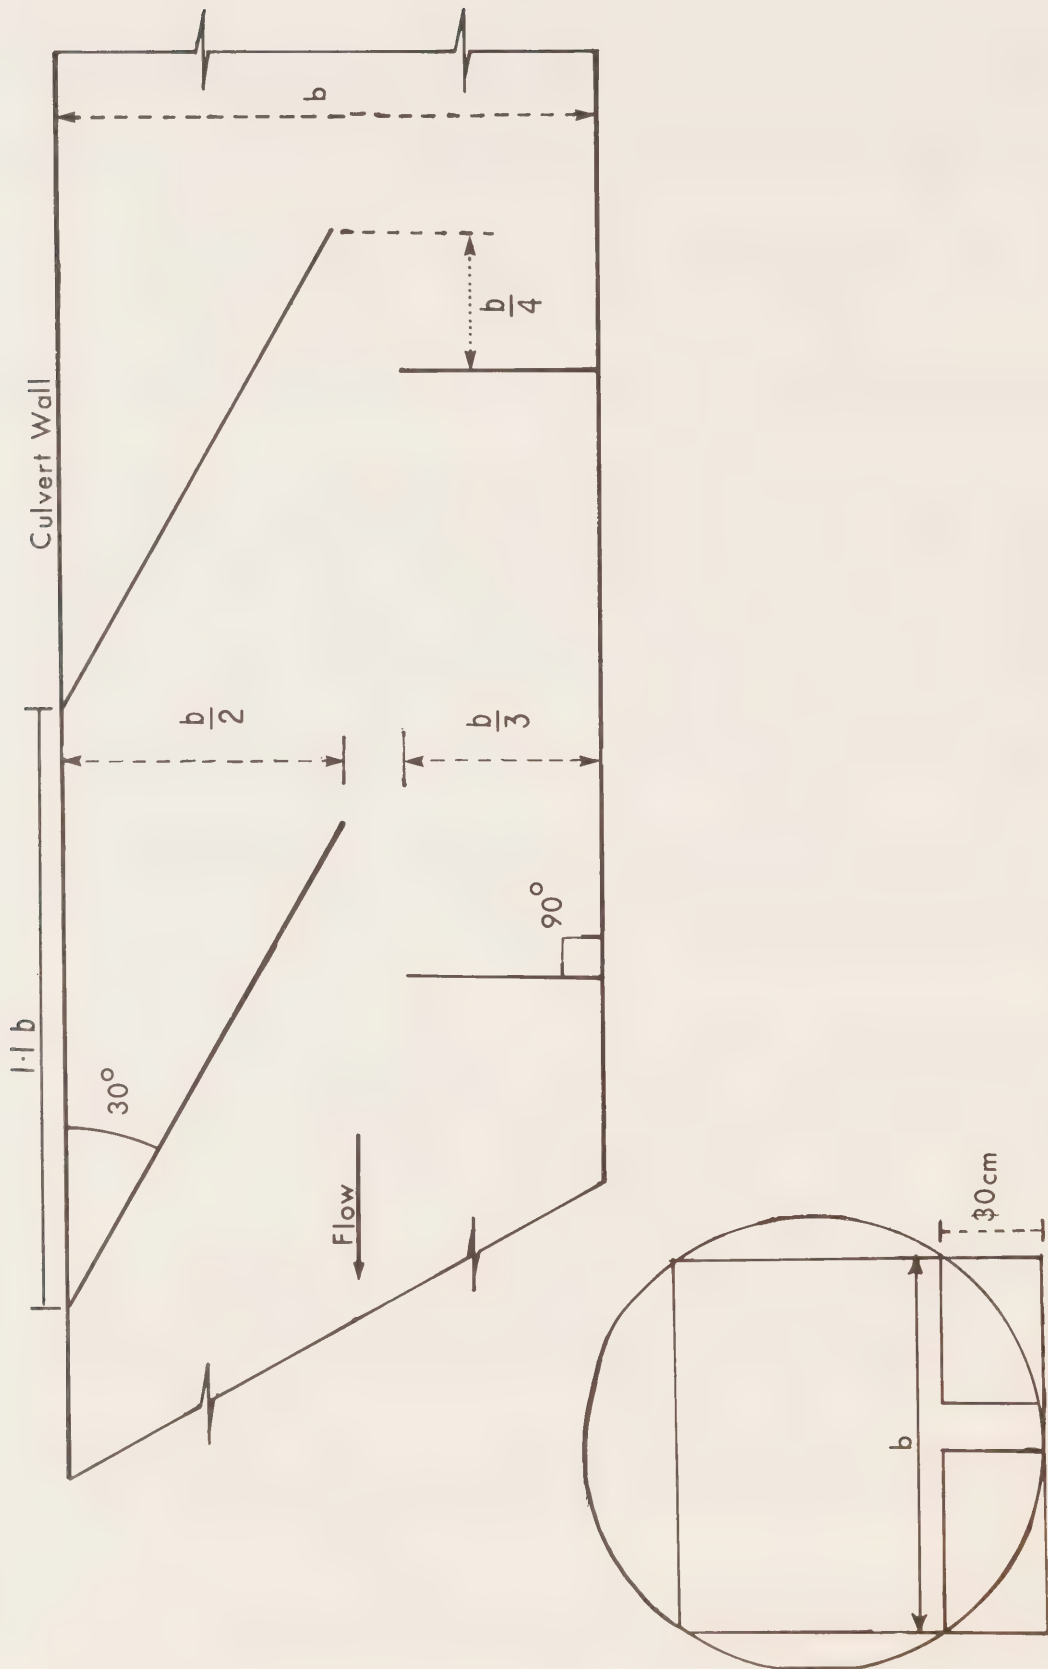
Recommended baffle pattern for cylindrical and box culverts.
